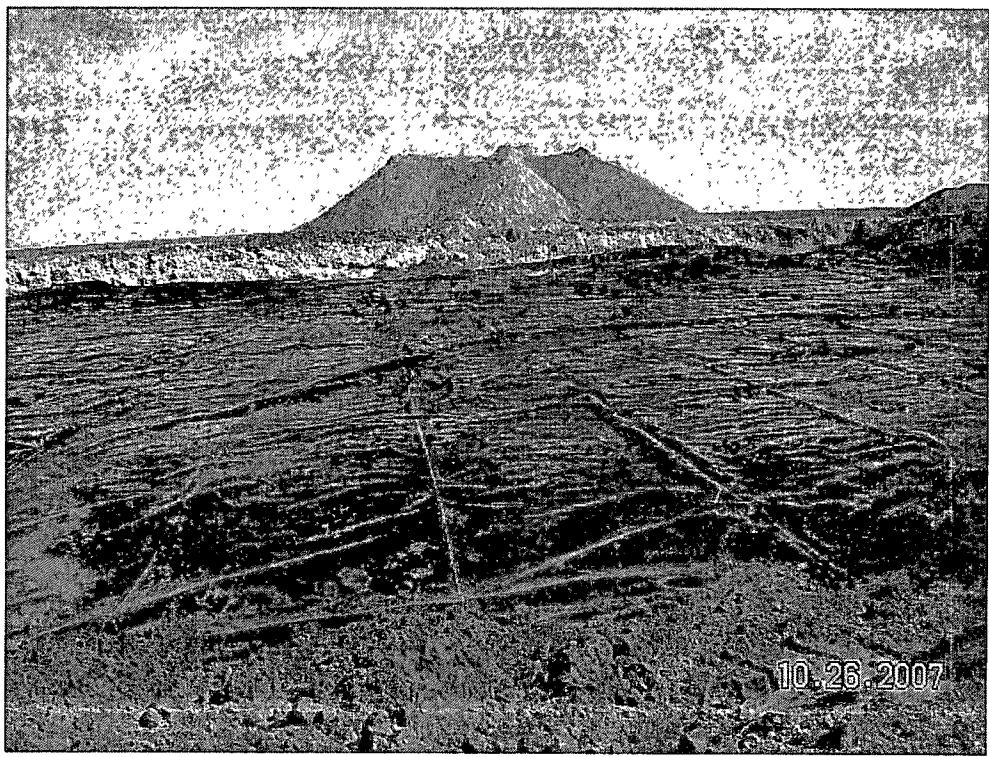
Looking easterly at backfilling of excavation area.
